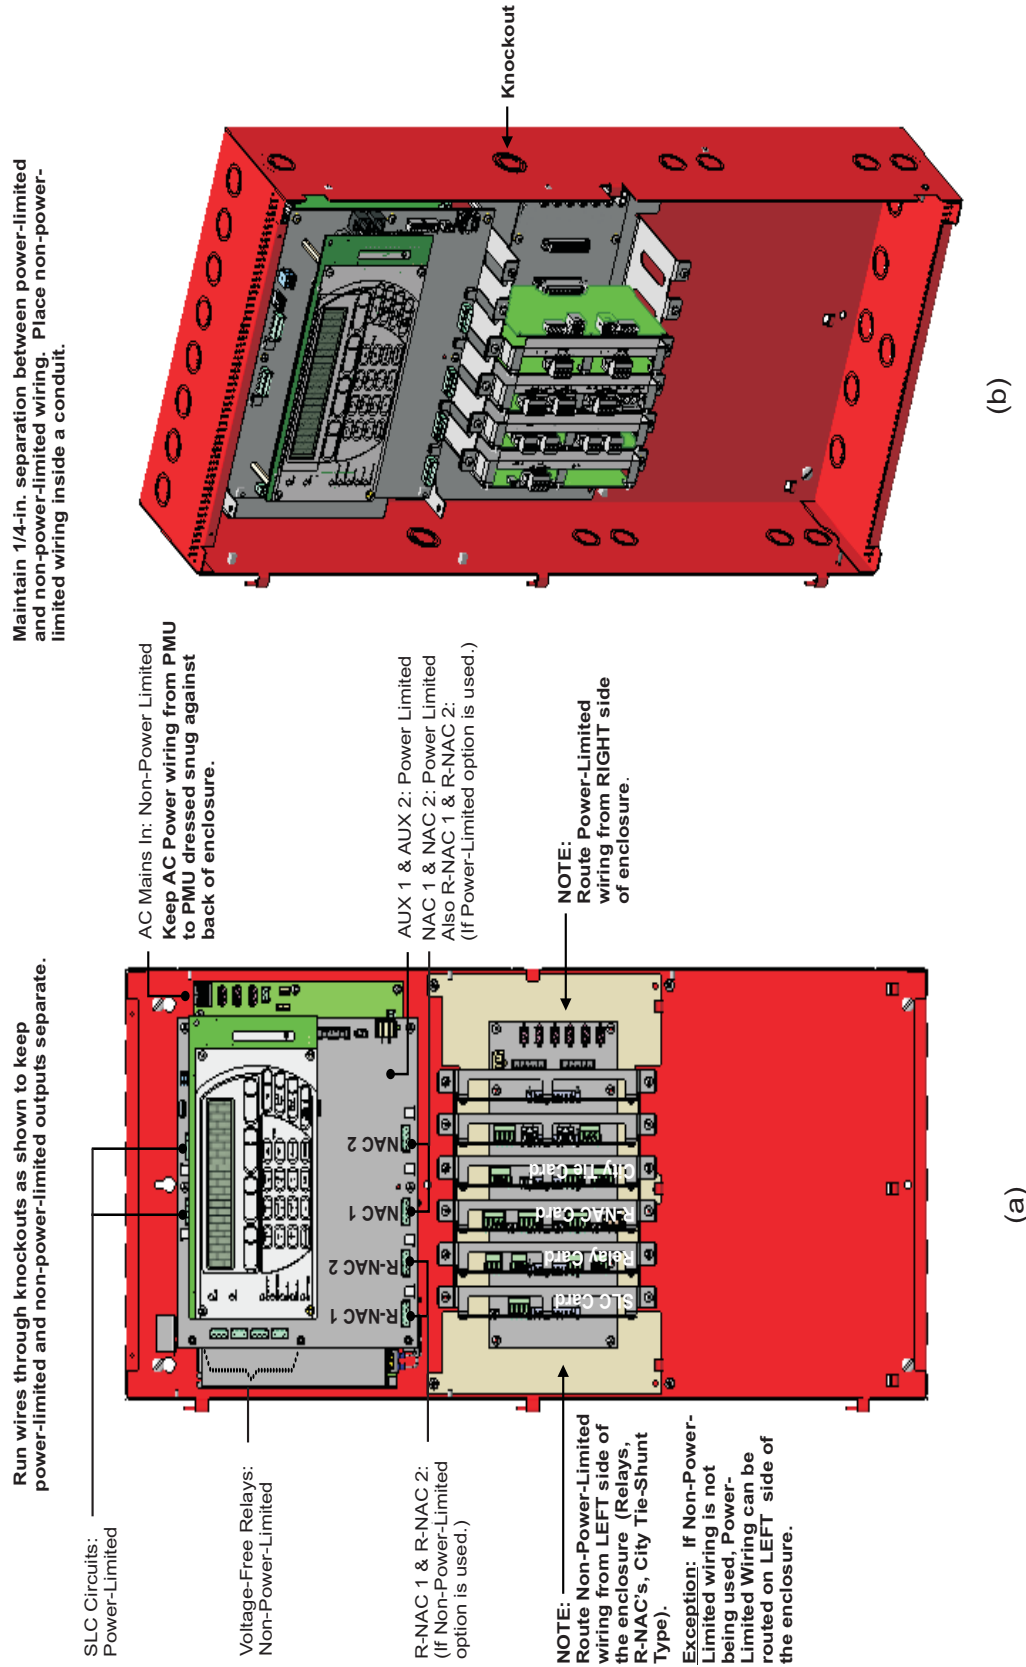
Example Showing Wiring in 3-Tiered Enclosure with Card Cage Assembly (a); Location of knockouts (b)
